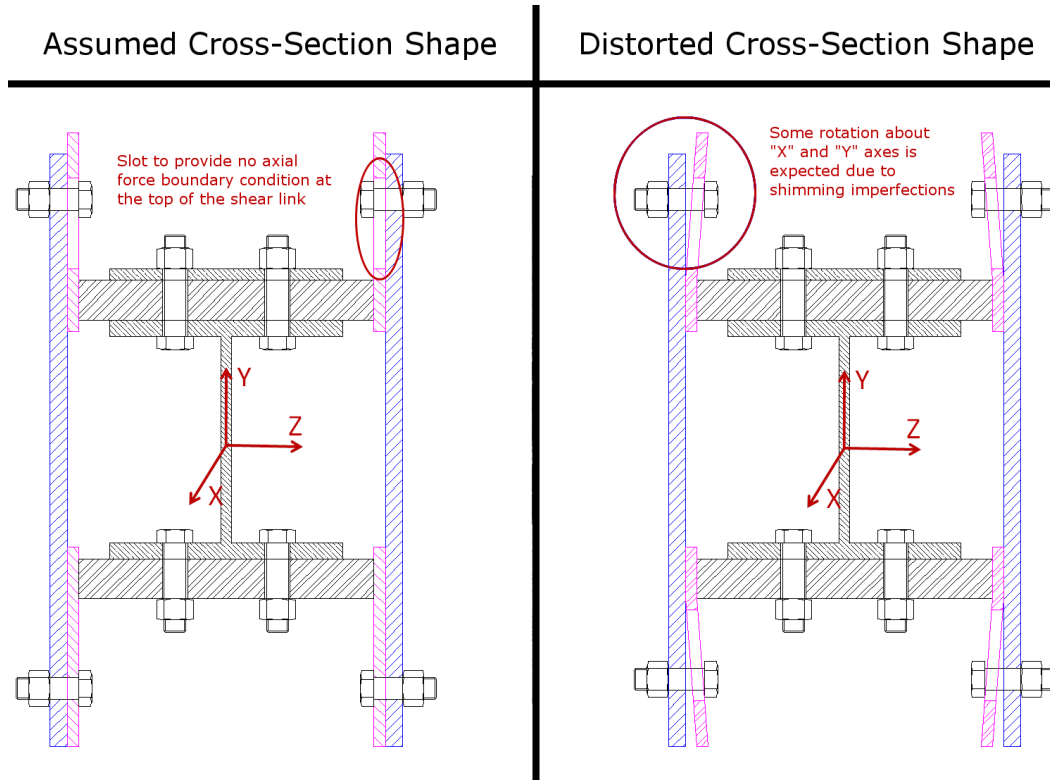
Prototype Beam - Section Cut A-A - Distortion Due to Welding
